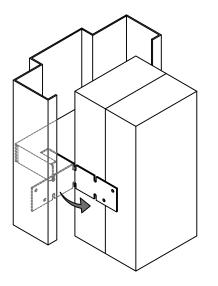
Snap or weld in anchors wood/ steel studs
